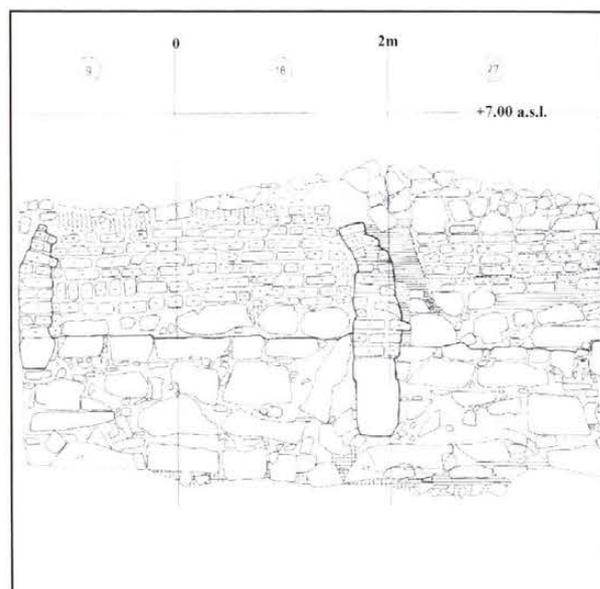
The east section of the wall surrounding outer bailey II of Kuusisto Castle (view from the west). The original brickwork was revealed in excavations conducted in the 1980s. Beneath the later conservation layers was the original wall structure, with a threshold on top followed by brickwork with the remains of large brick arches. (The archives of the Dept. of Monuments and Sites, NBA. Kuusisto Castle.)
